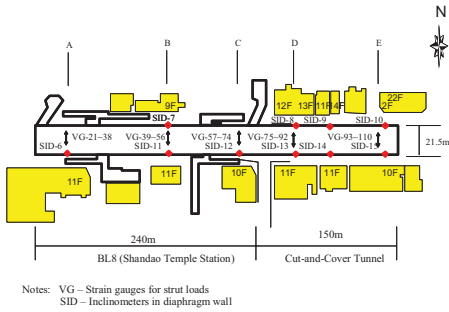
Layout of Shandao Temple Station and locations of instrumented sections.
